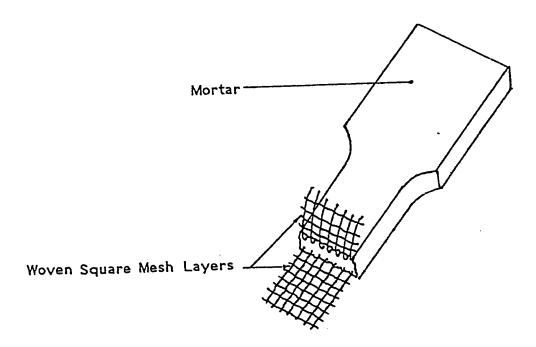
A typical ferrocement specimen reinforced with 2 layers of woven square mesh.
